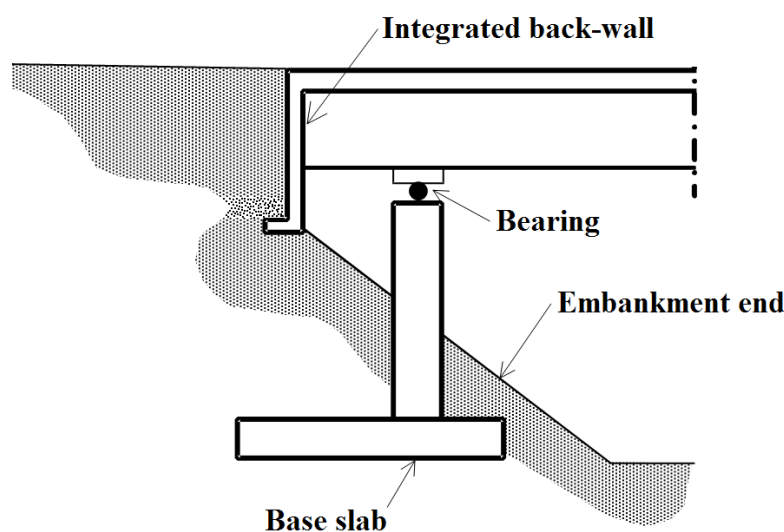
Illustration of the back-wall and column of a back-wall bridge, WebLCC (2011)
